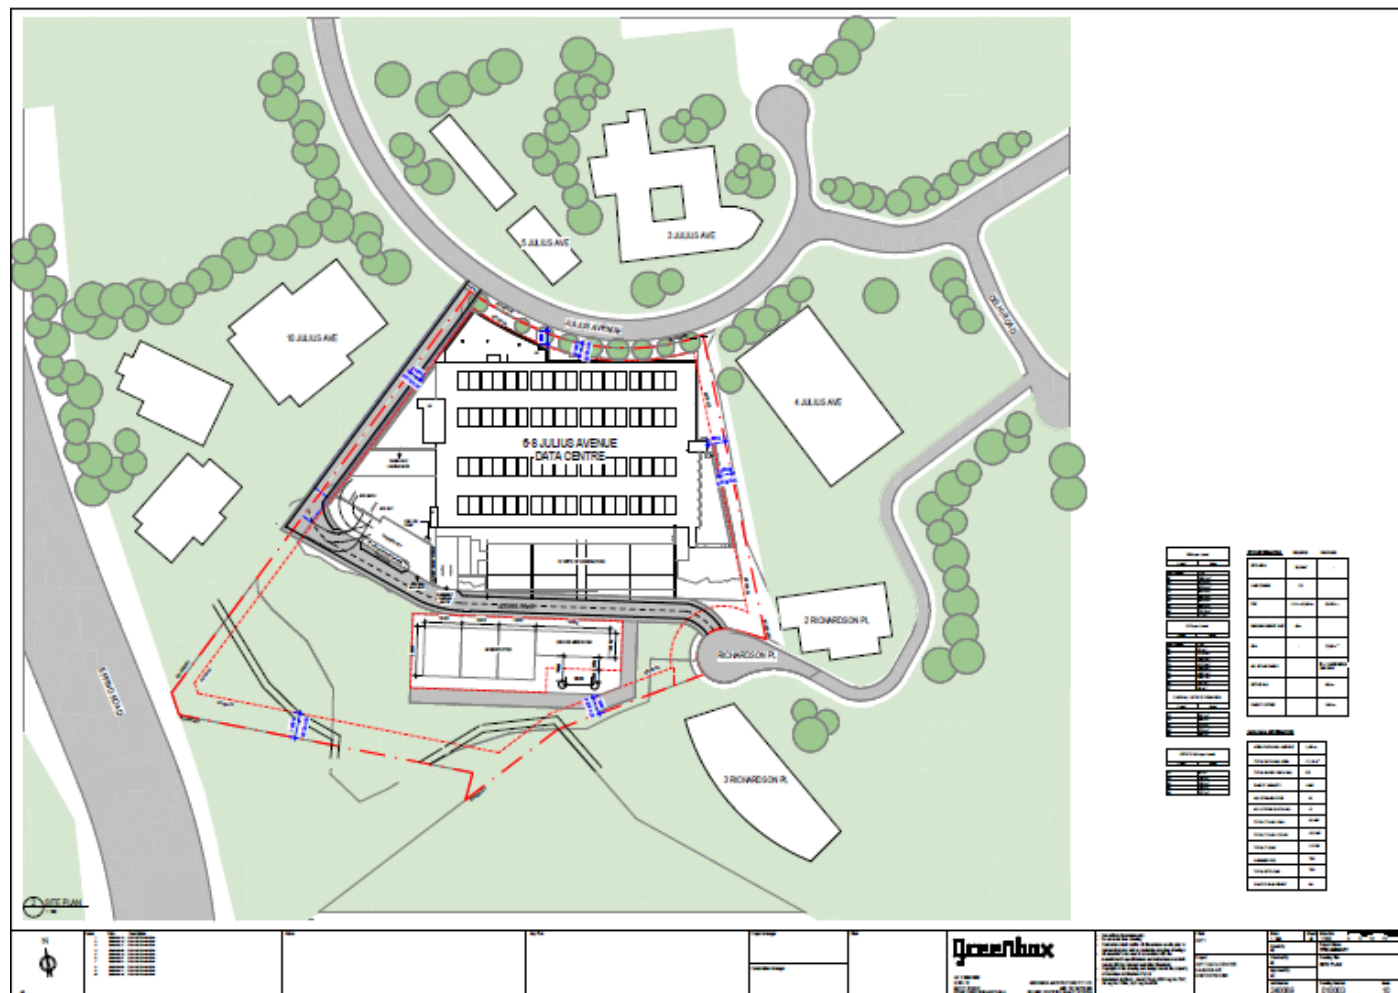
Plan of the proposed works. (Source: Greenbox Architecture, 2025)
